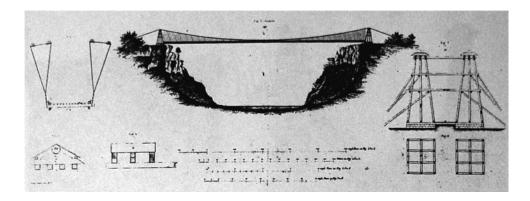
Niagara Bridge from Ellet, 1848 - 1854 (Werner 1973)
